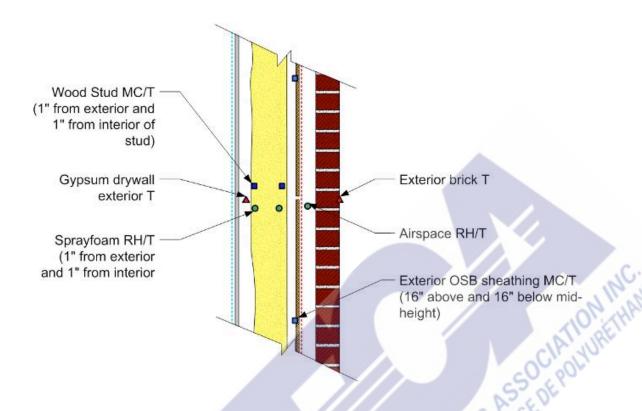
Wood Stud Wall Assembly (Walls 6, 7, 8) close-up of sensors
